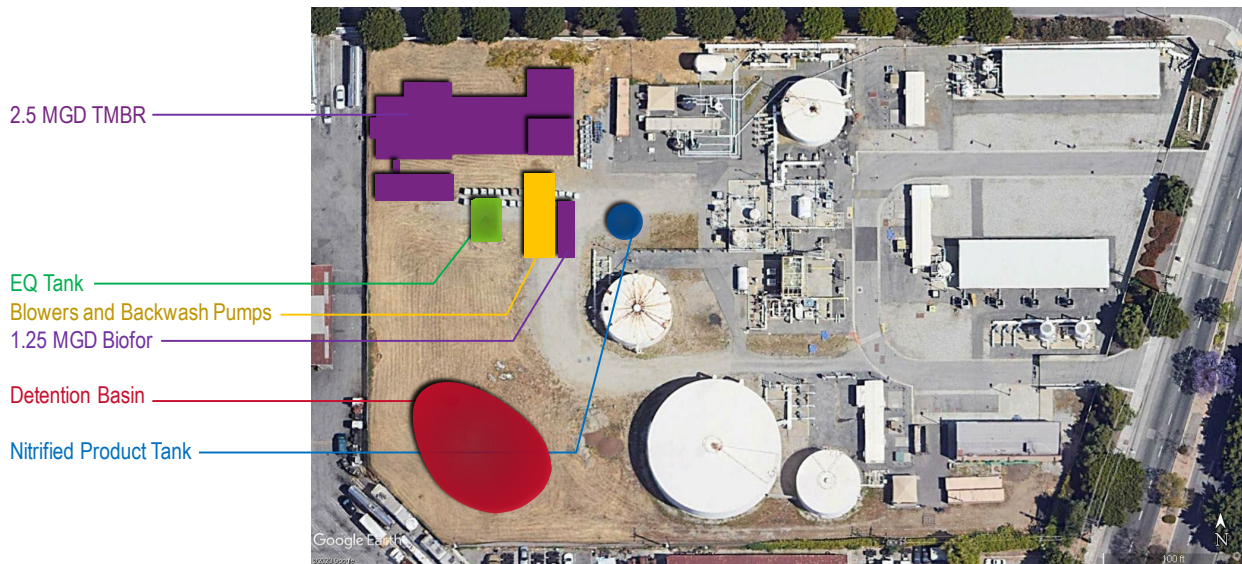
JMMCRWRP Nitrification Scenario A Expansion Alternative 2 Proposed Site Layout
